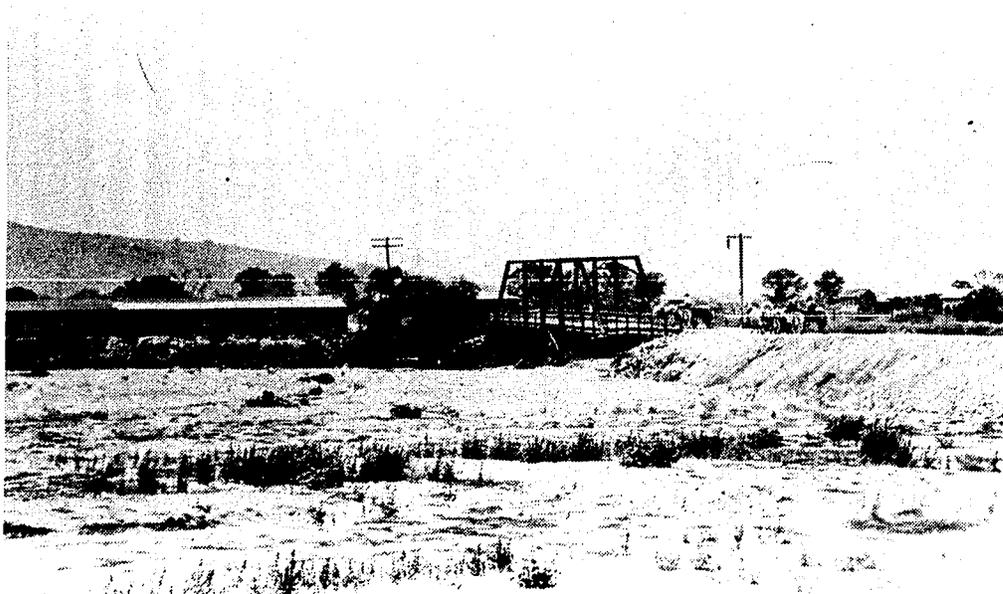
A similar view as Figure 54 in July 1915. A berm was built to join the east approach to the bridge (Special Collections, University of Arizona Library, Tucson).
